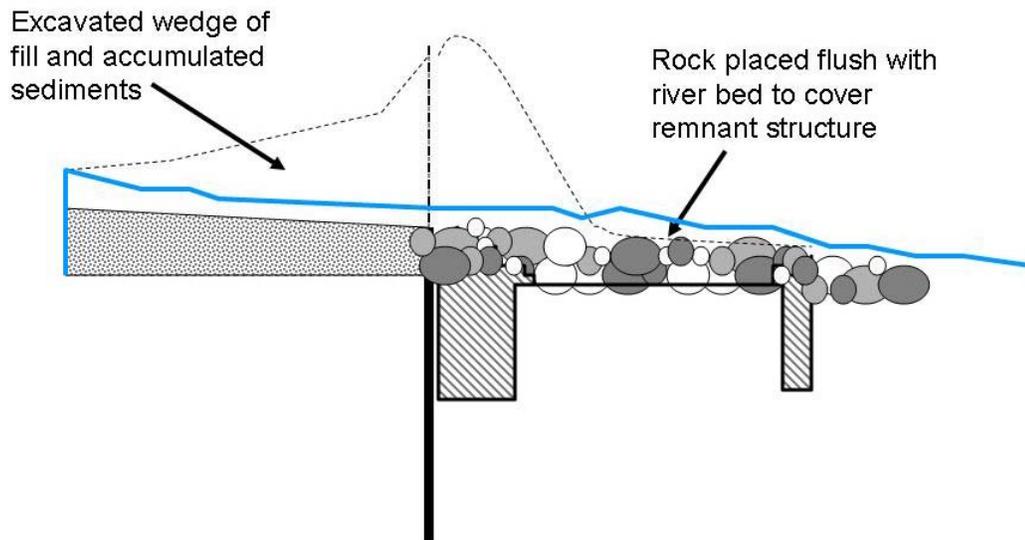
Cross section of full Pool Removal at 5th Avenue Dam
